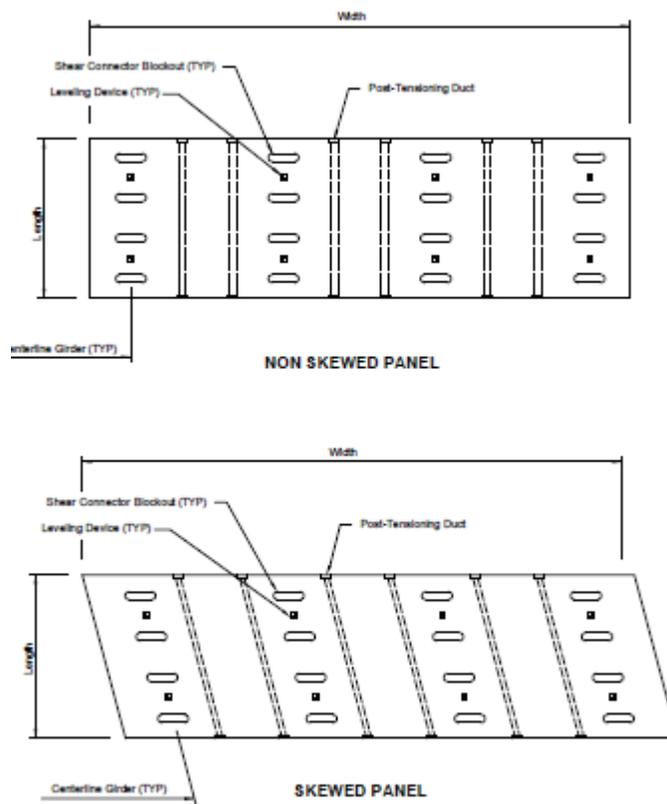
Typical plans for non-skewed and skewed panels.
